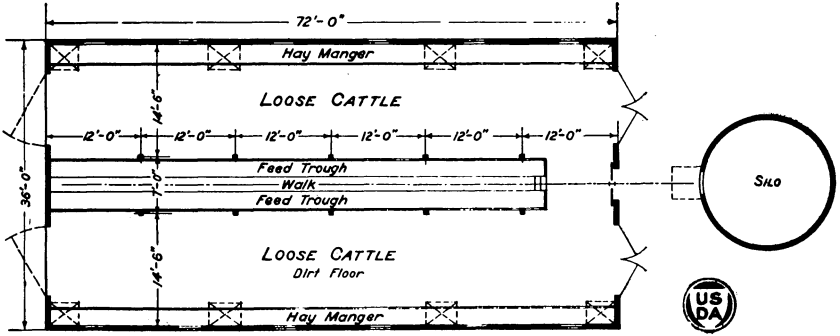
Alternate floor plan for designs Nos. 1175 and 1185.
